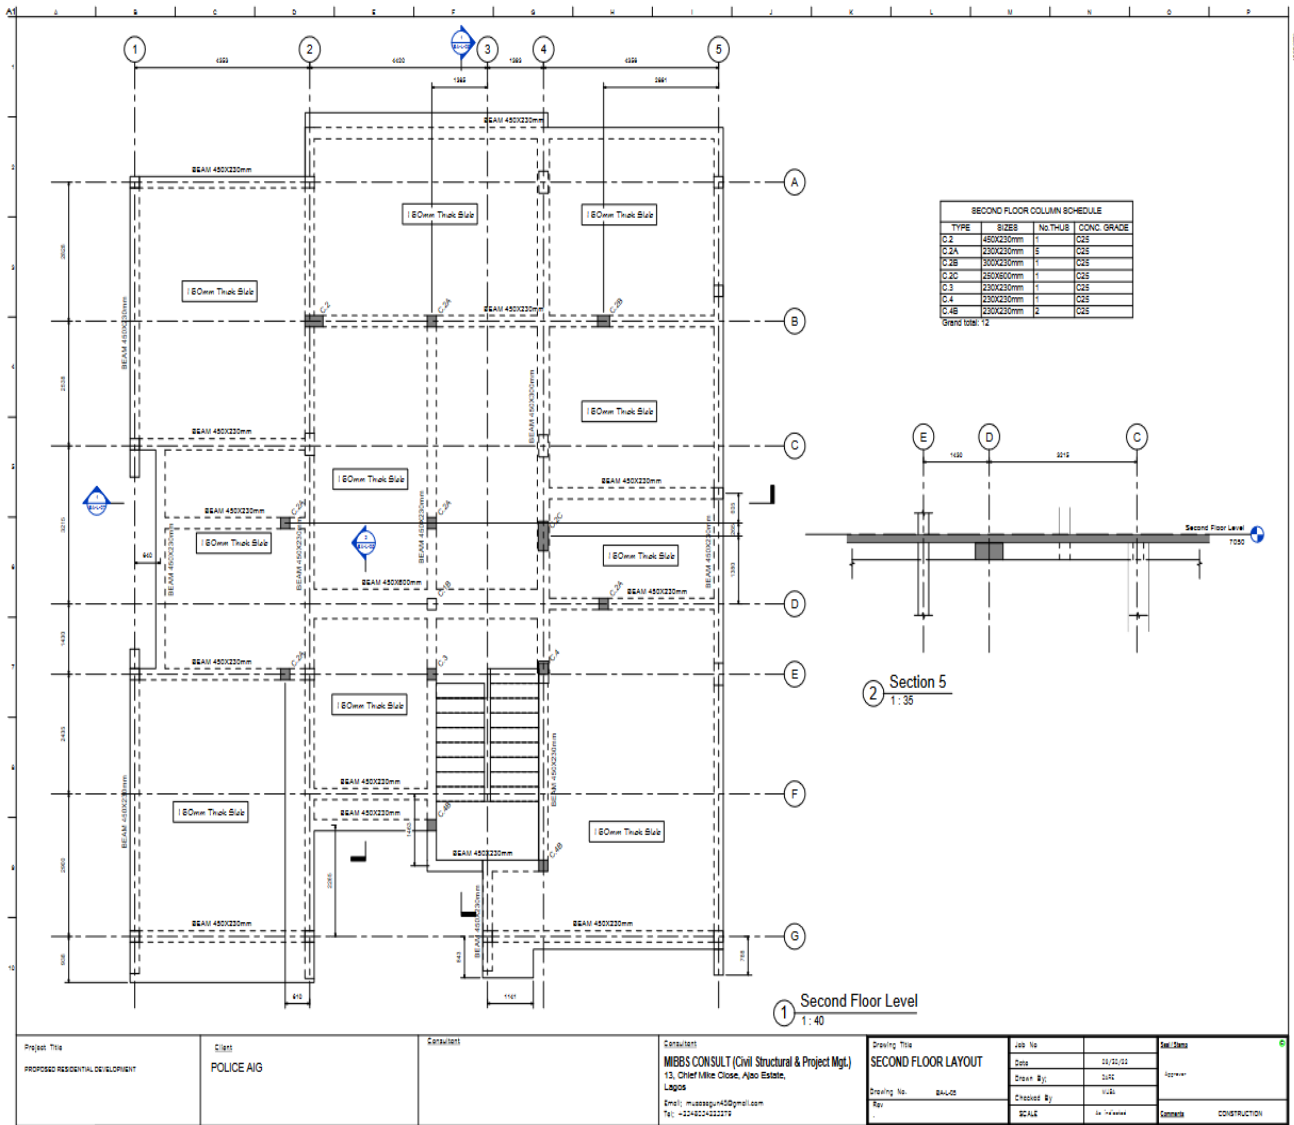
STRUCTURAL SECOND FLOOR OF THE INVESTIGATED BUILDING
